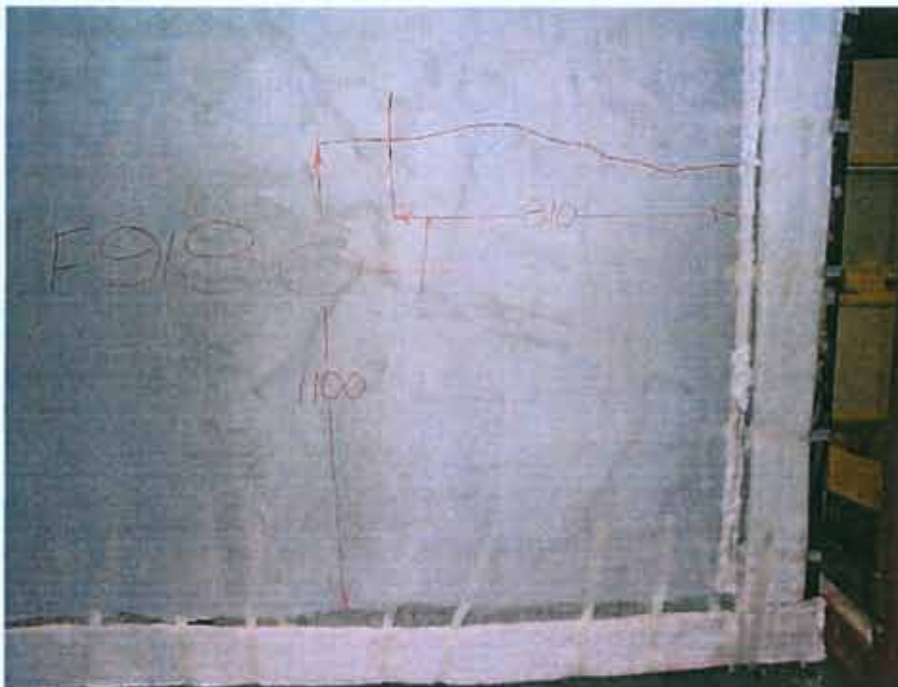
Exposed face horizontal hairline crack on western lower corner prior to commencement of the fire resistance test.
